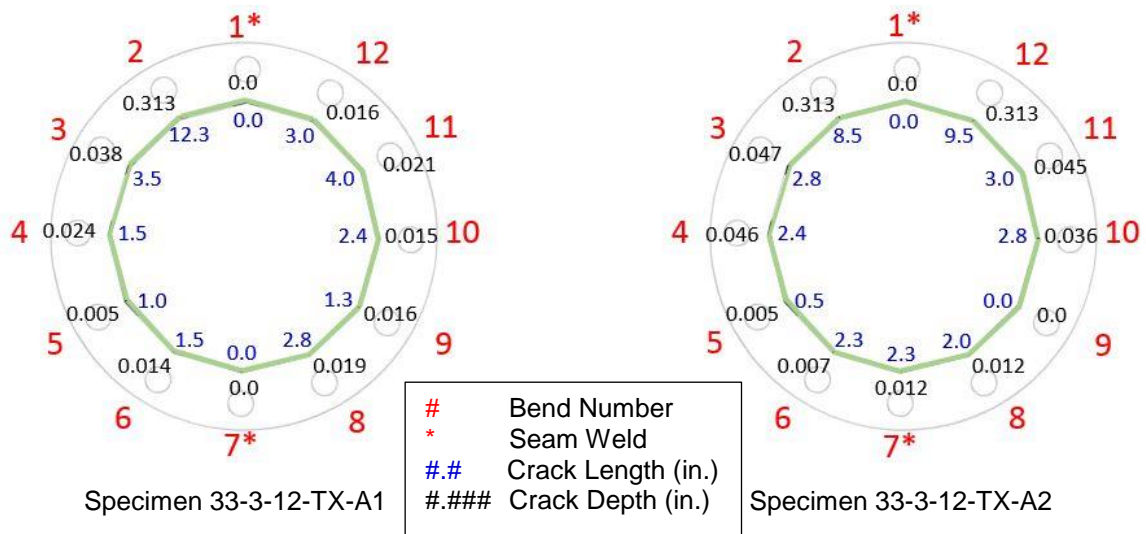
Specimens 33-3-12-TX-A1 and 33-3-12-TX-A2: Cracks after 16.8 Million Fatigue Cycles
